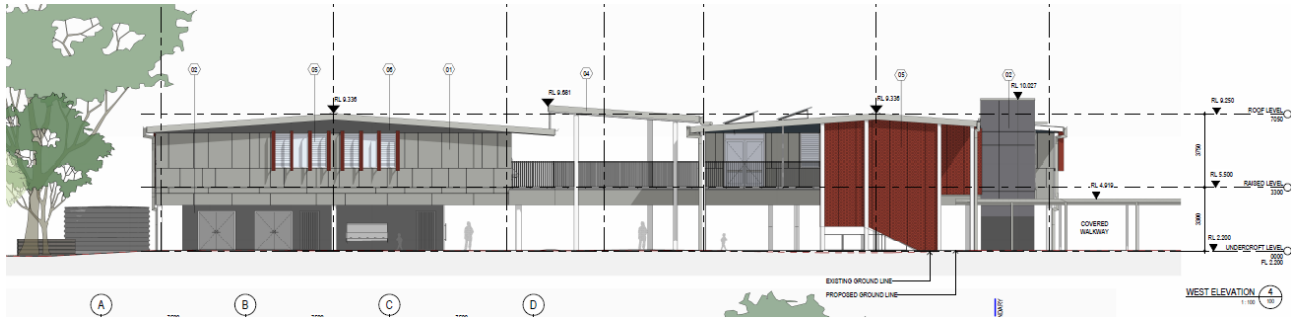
Elevated Floor Plan (Source: Pedavoli Architects)
